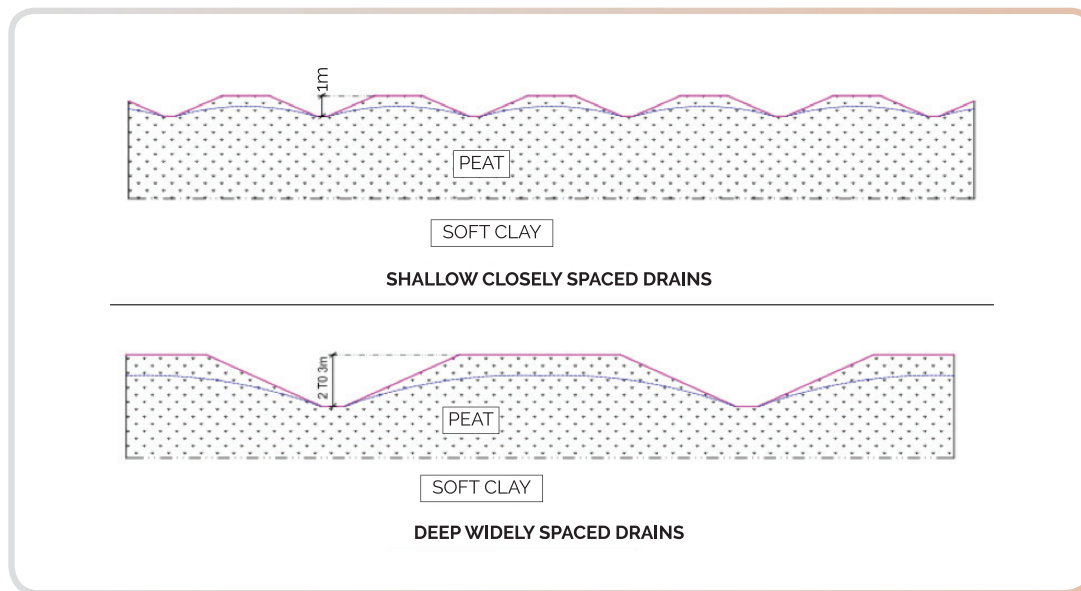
12. Surface drainage to lower ground water to form access to peat swamp for filling. Toh & Chee (2008)
